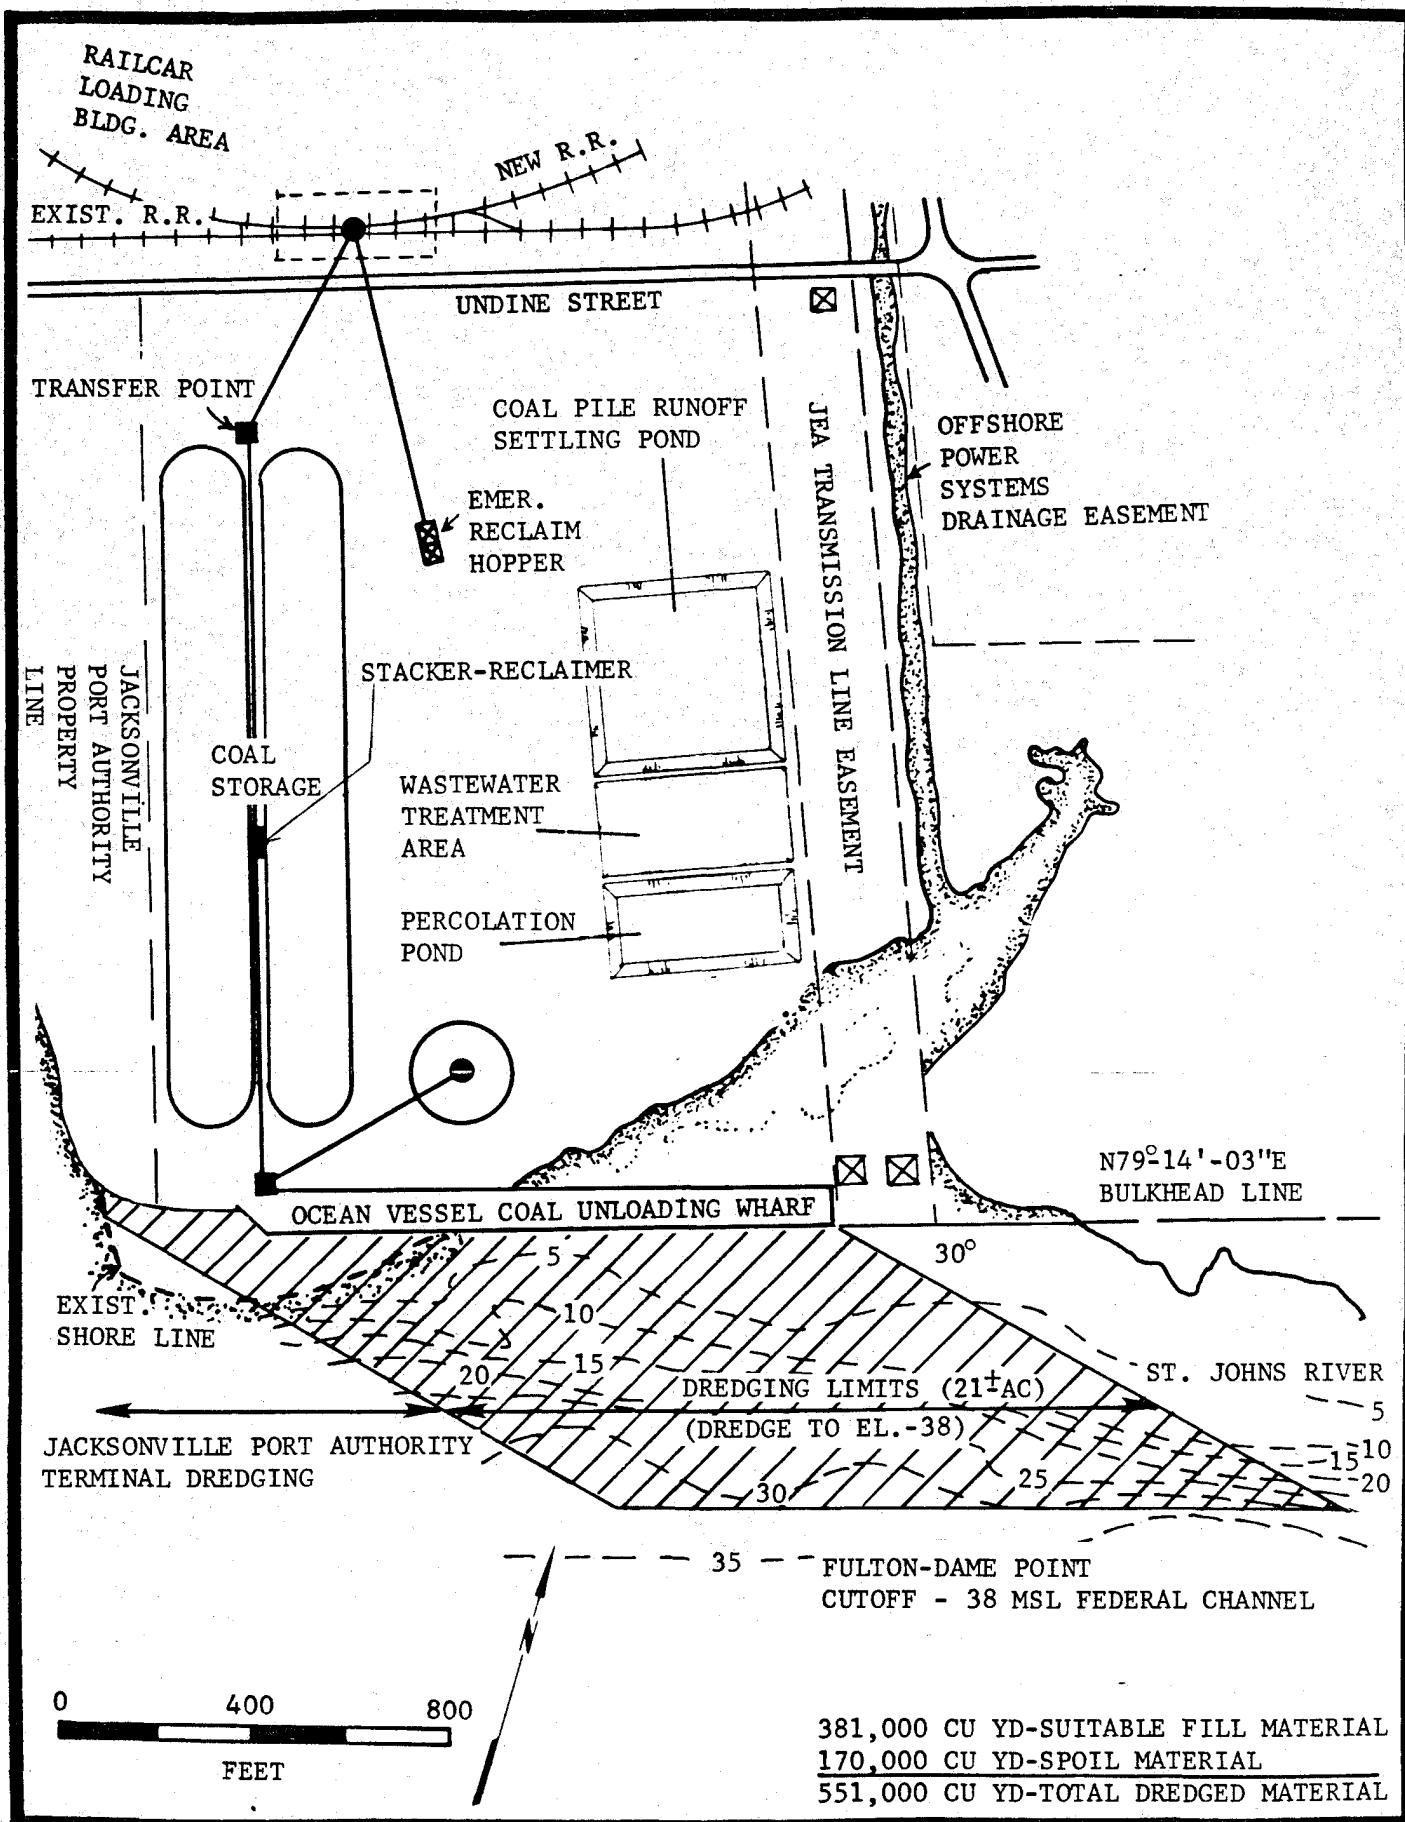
Coal Unloading Facility Layout and Dredging Plan
